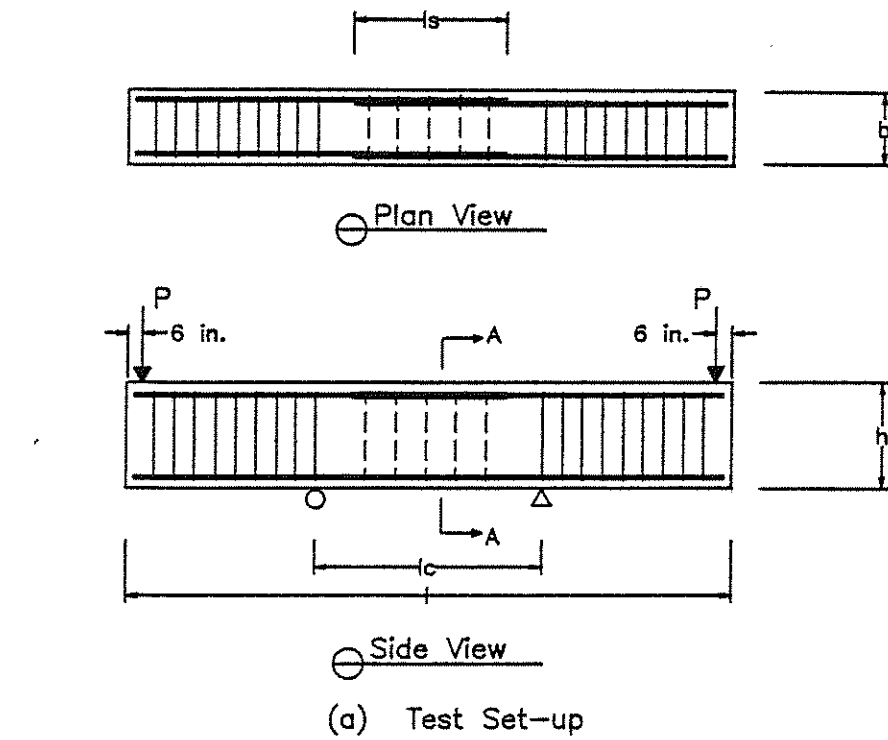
Bottom-cast splice test specimens (1 in. = 25.4 mm)
